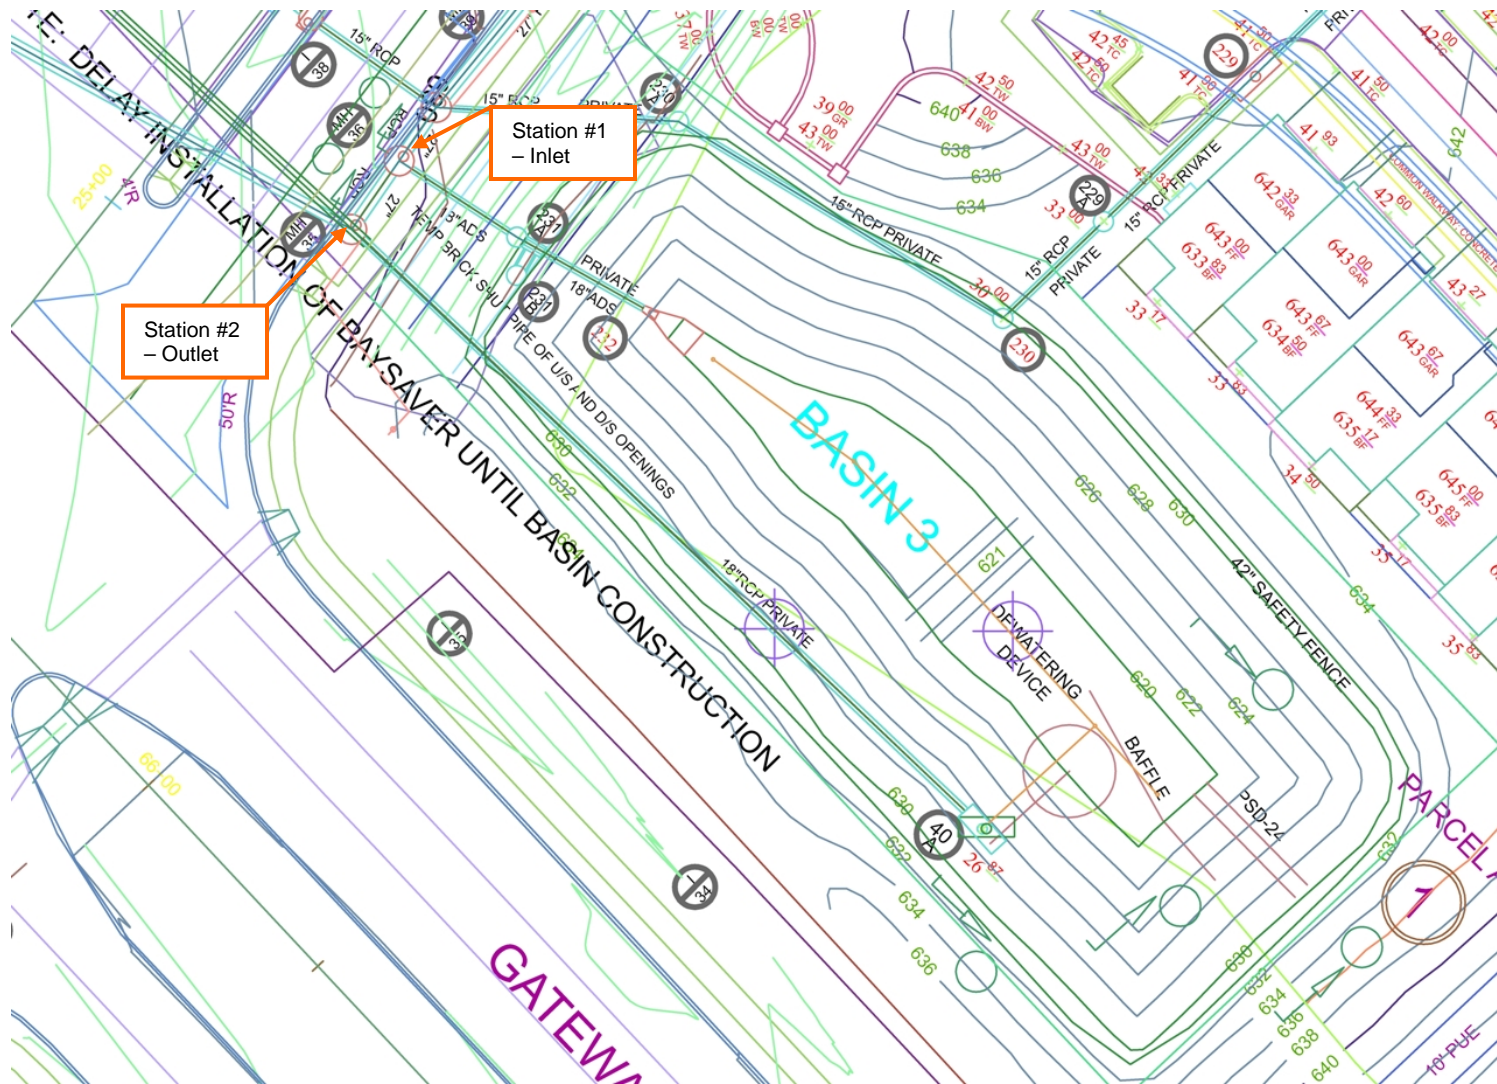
Plan view and sampling locations of Stringtown Rd. Extension Sediment Basin #3.
